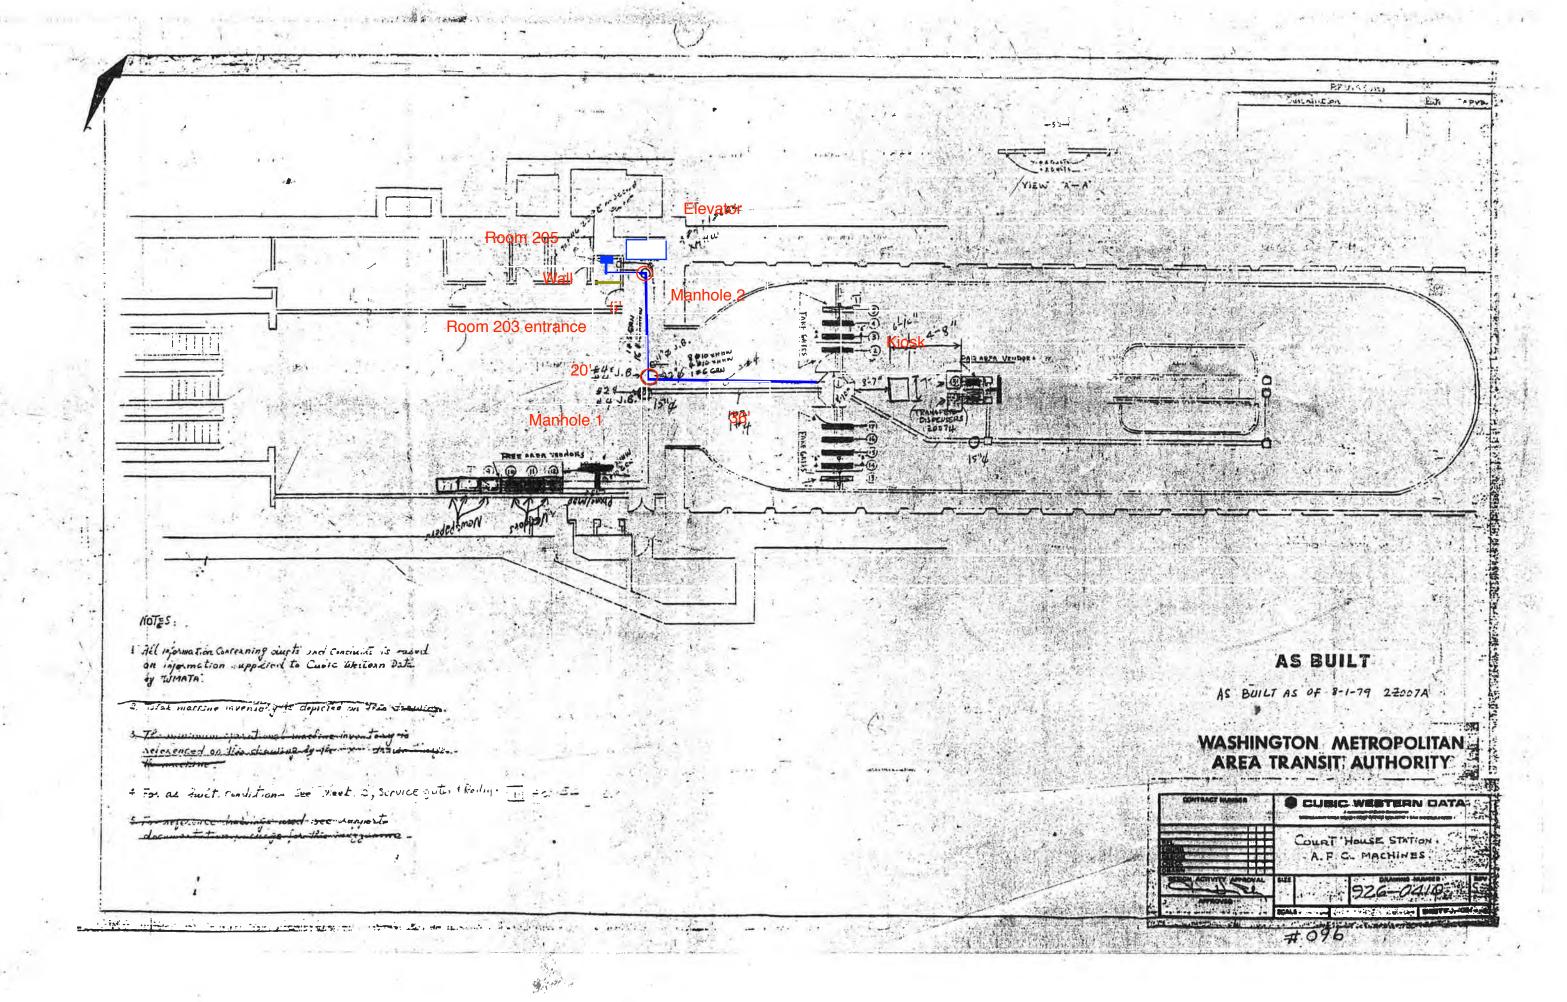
K01 Court House – Duct run from manhole 2 to AFC Panel
